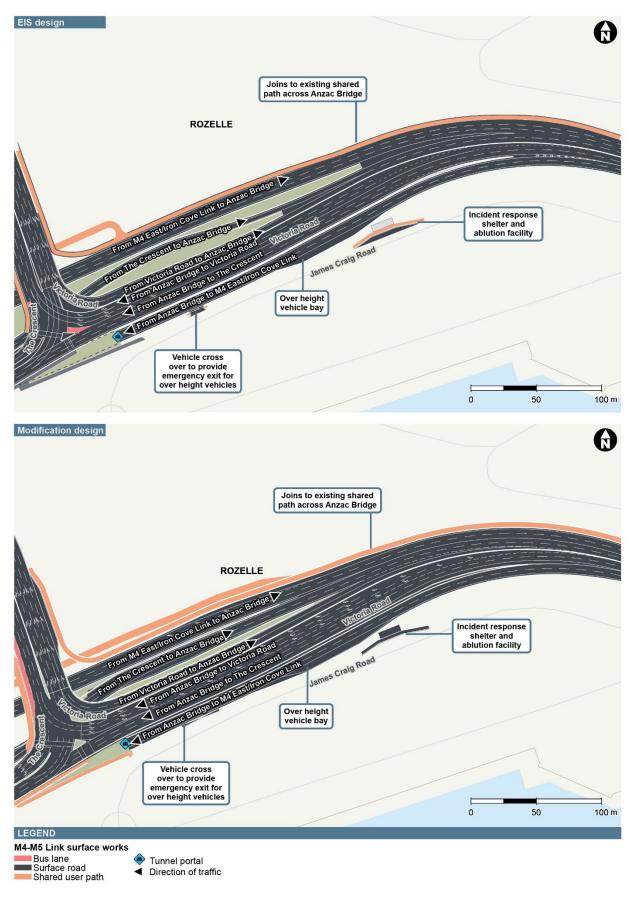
Approach to Anzac Bridge layout in EIS and proposed modification model
